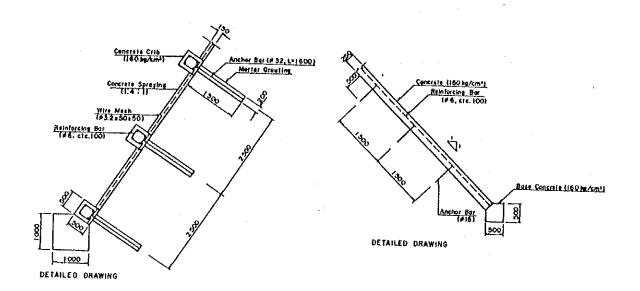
(3) Concrete Crib with Concrete Spraying and Anchoring (Type 3)
